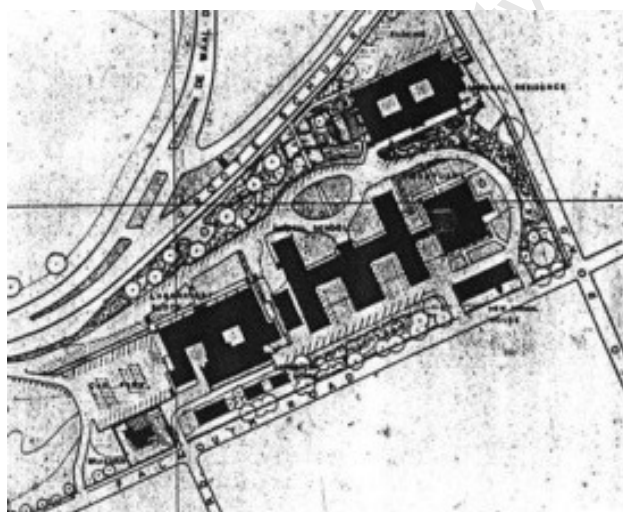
1921 plan showing proposed W&B North block⁷⁹.
